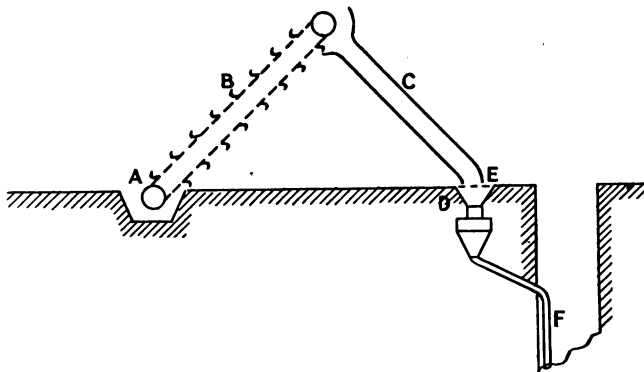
Sketch showing Surface Arrangements for Conveyance of "Stowage" Material to the Shaft.
